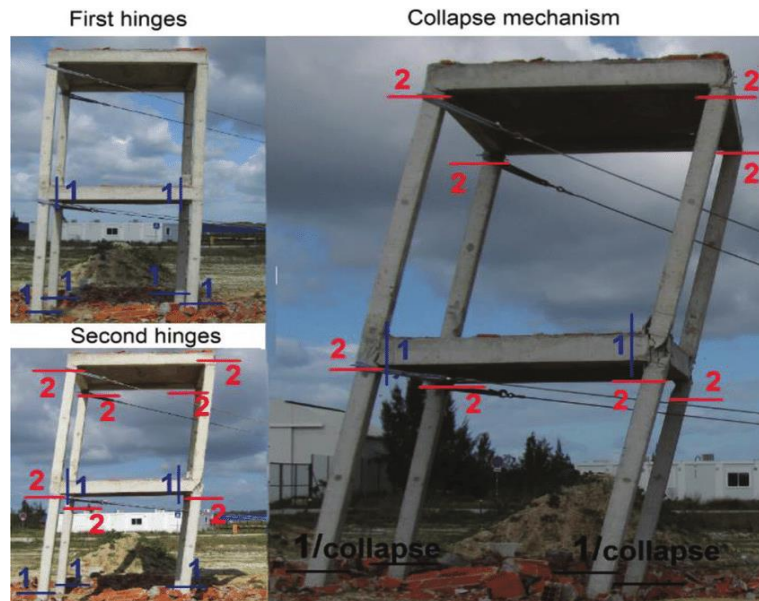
Progression of Plastic Hinges and Collapse Mechanism in a Reinforced Concrete Frame Under Lateral Loading [56].
